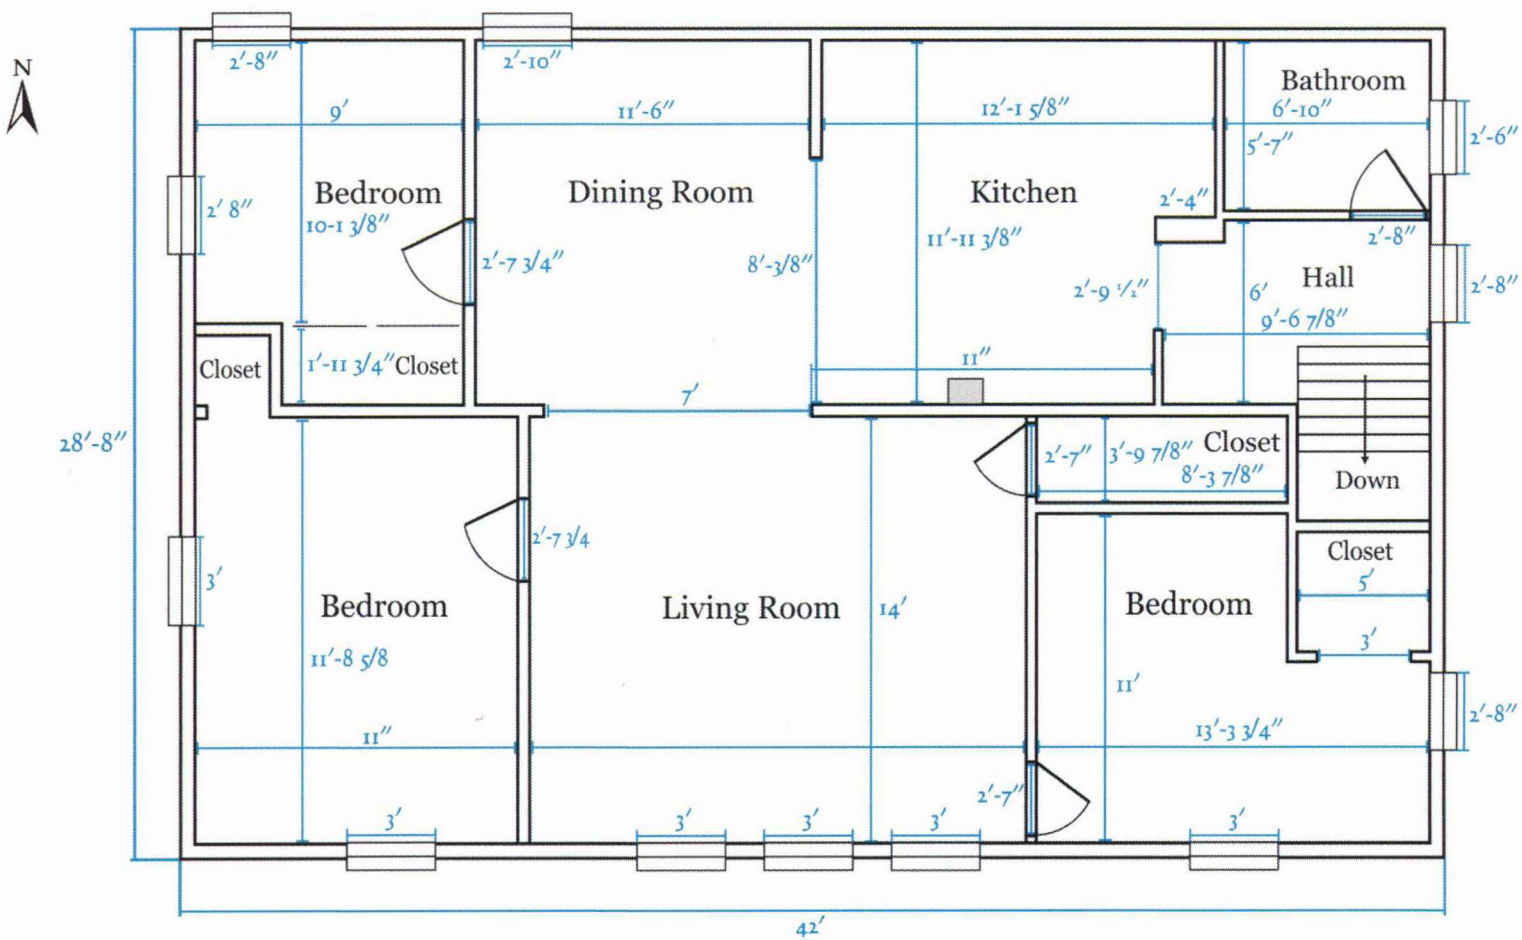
Second Floor Plan of Manthei Ford Garage, not to scale
